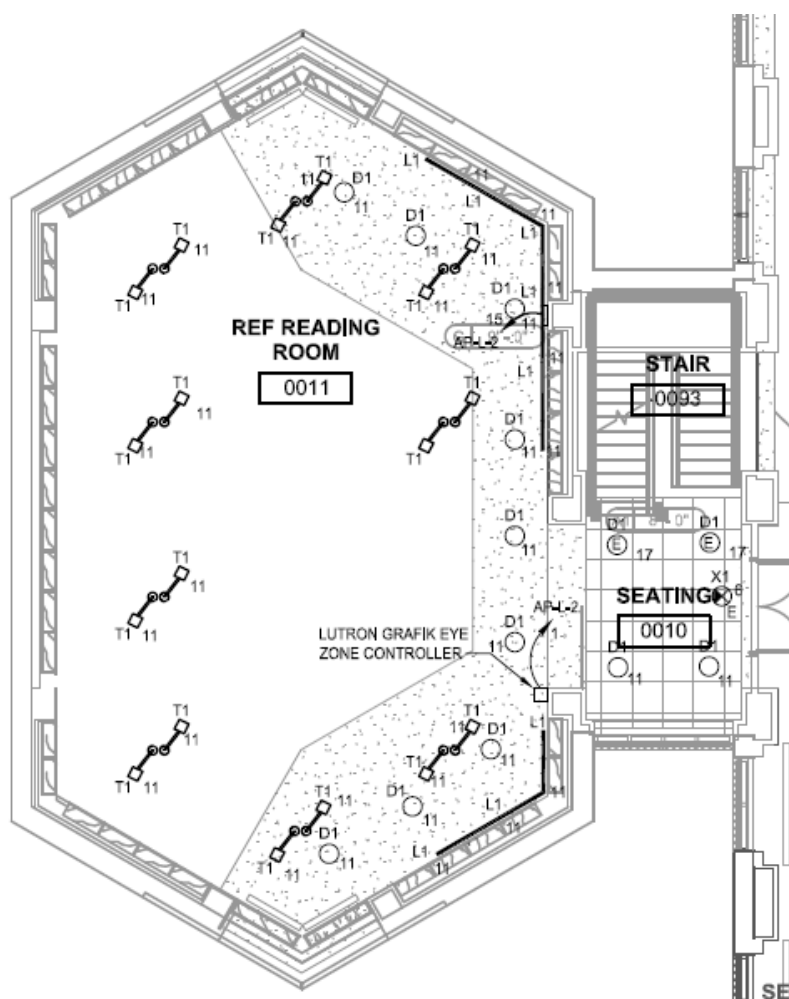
| Reference Reading Room - Lower Level Lighting Plan
